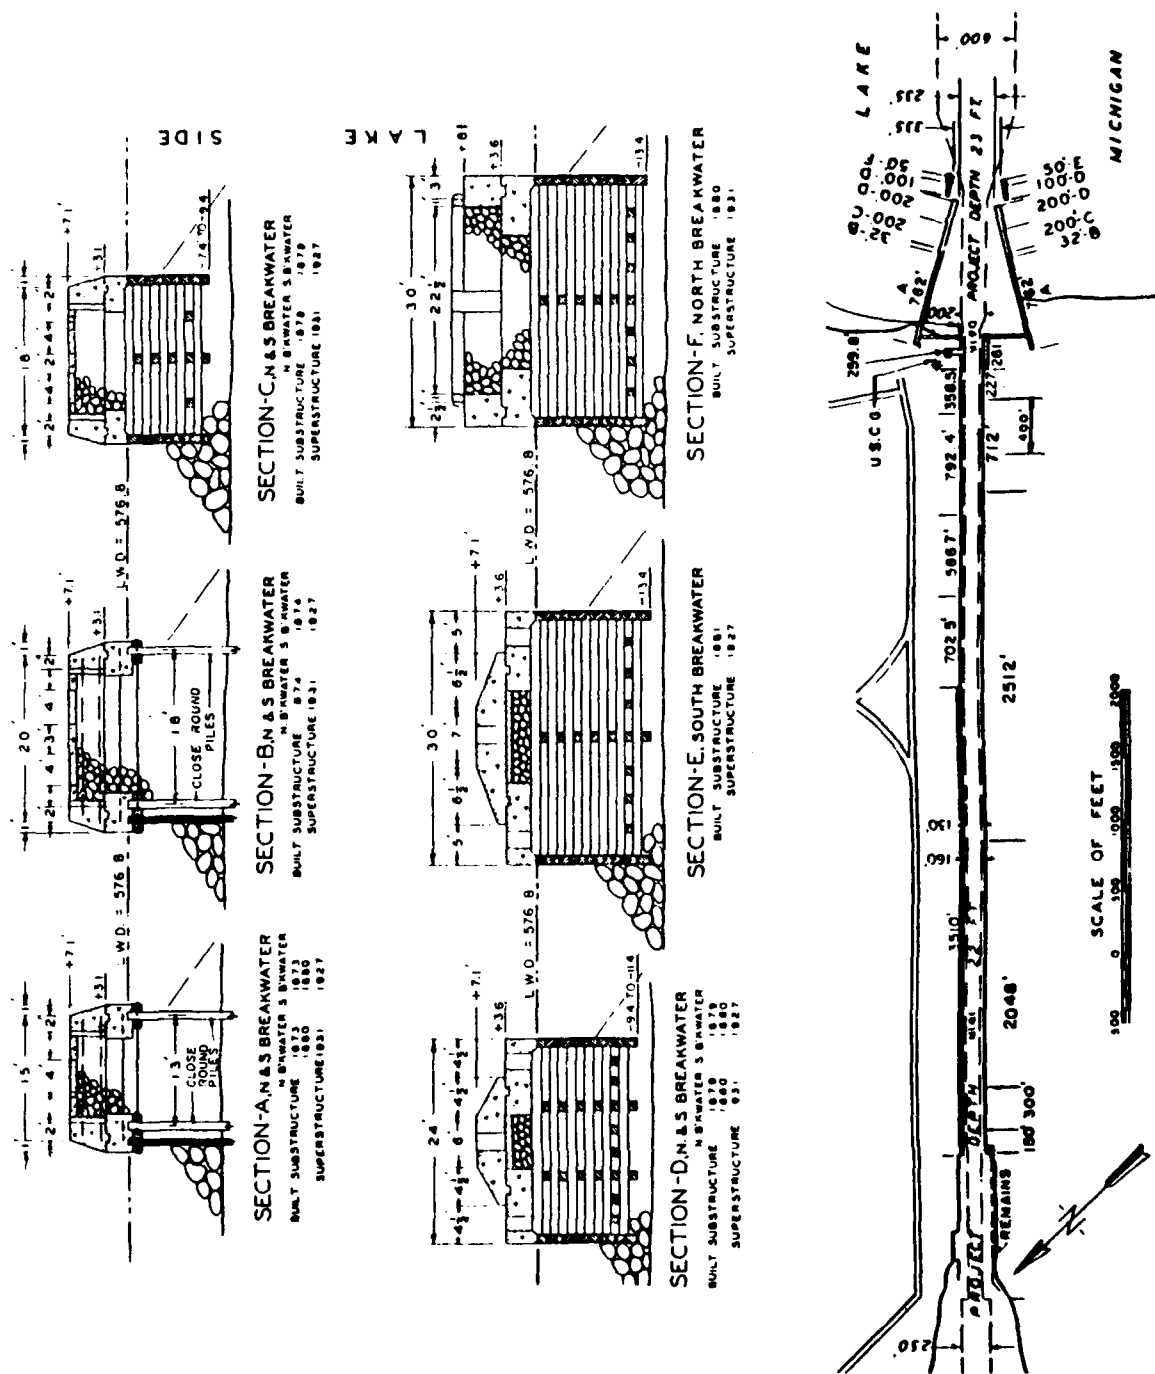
Typical breakwater cross sections, Sturgeon Bay, Wisconsin
